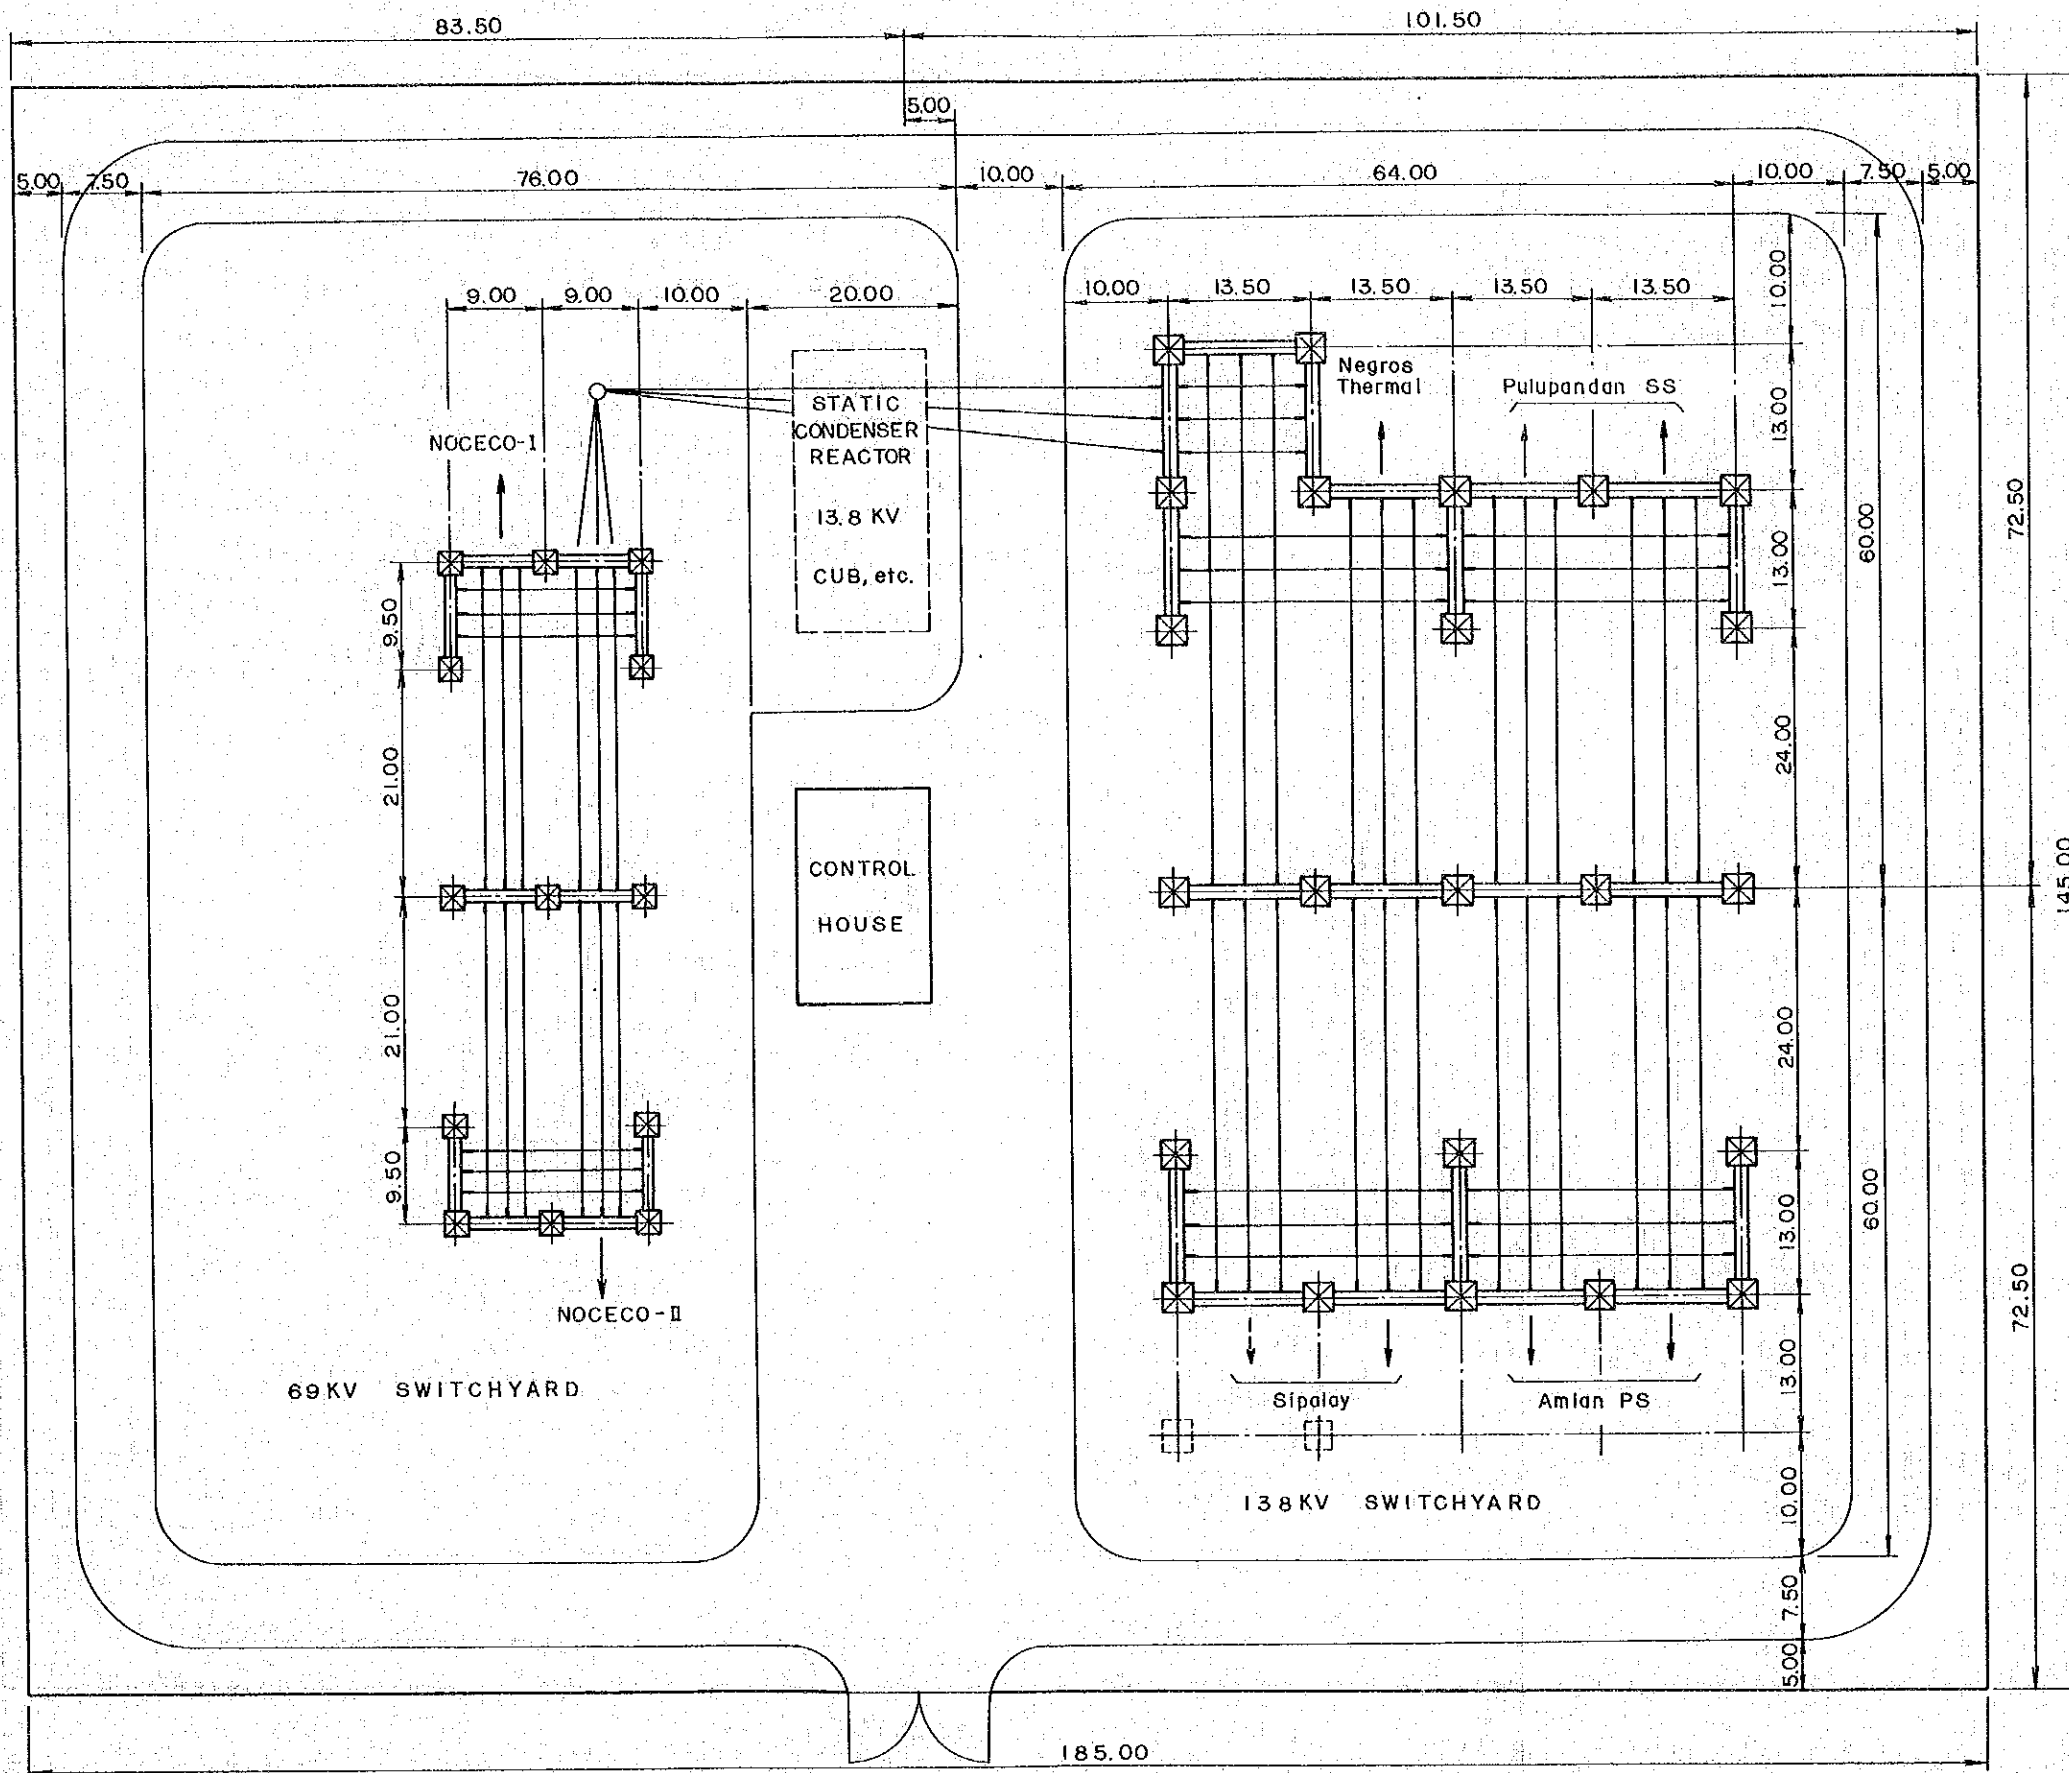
Pulupandan Substation Steel Structure Arrangement
